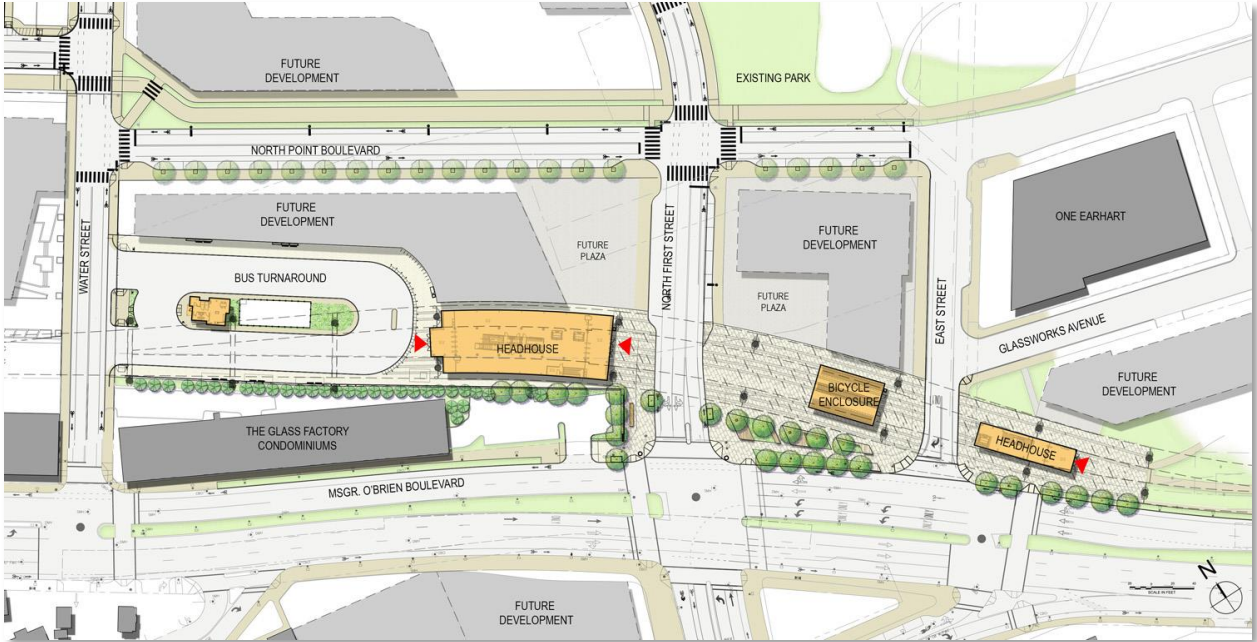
New MBTA Station at Lechmere in Cambridge – Halvorson Design, Landscape Architect
